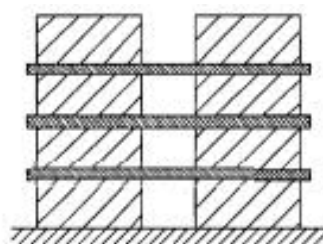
Composite or concrete walls coupled by steel or composite beams (type 3)
